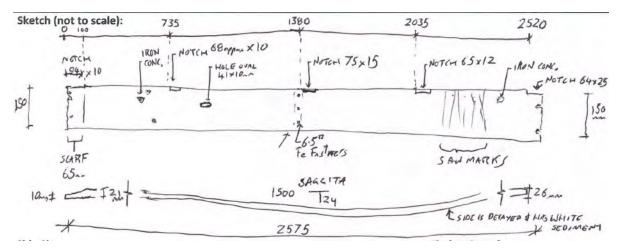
Working drawing by Ben Warton of Element (087) showing number of notches, iron (fe) fasteners and tool marks.
